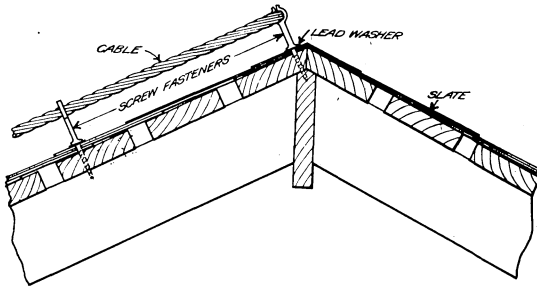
Use of screw fasteners on shingle, metal, or slate roofs.
